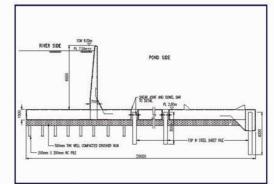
Reinforced Concrete (RC) Wall supported by disconnected pile foundation. Piles are disconnected from inlet base with a layer of 500mm thick crusher run
